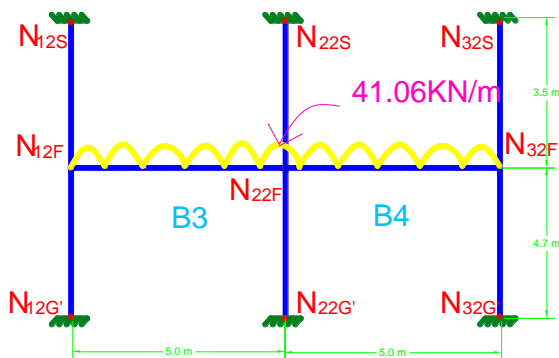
Substitute Frame -2 for the First Floor Beam B3 - B4 (FSF2)
